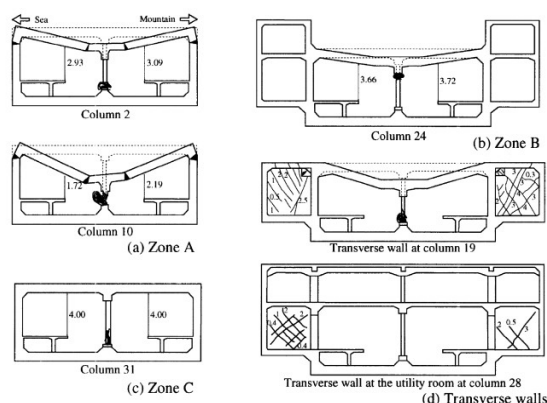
Schematic figure showing the damage pattern in the transverse direction.
